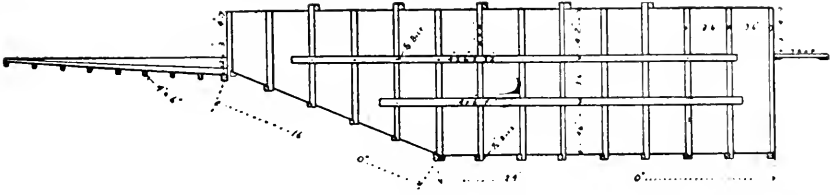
Side view of dipping vat, showing inclined egress and dripping floor.
